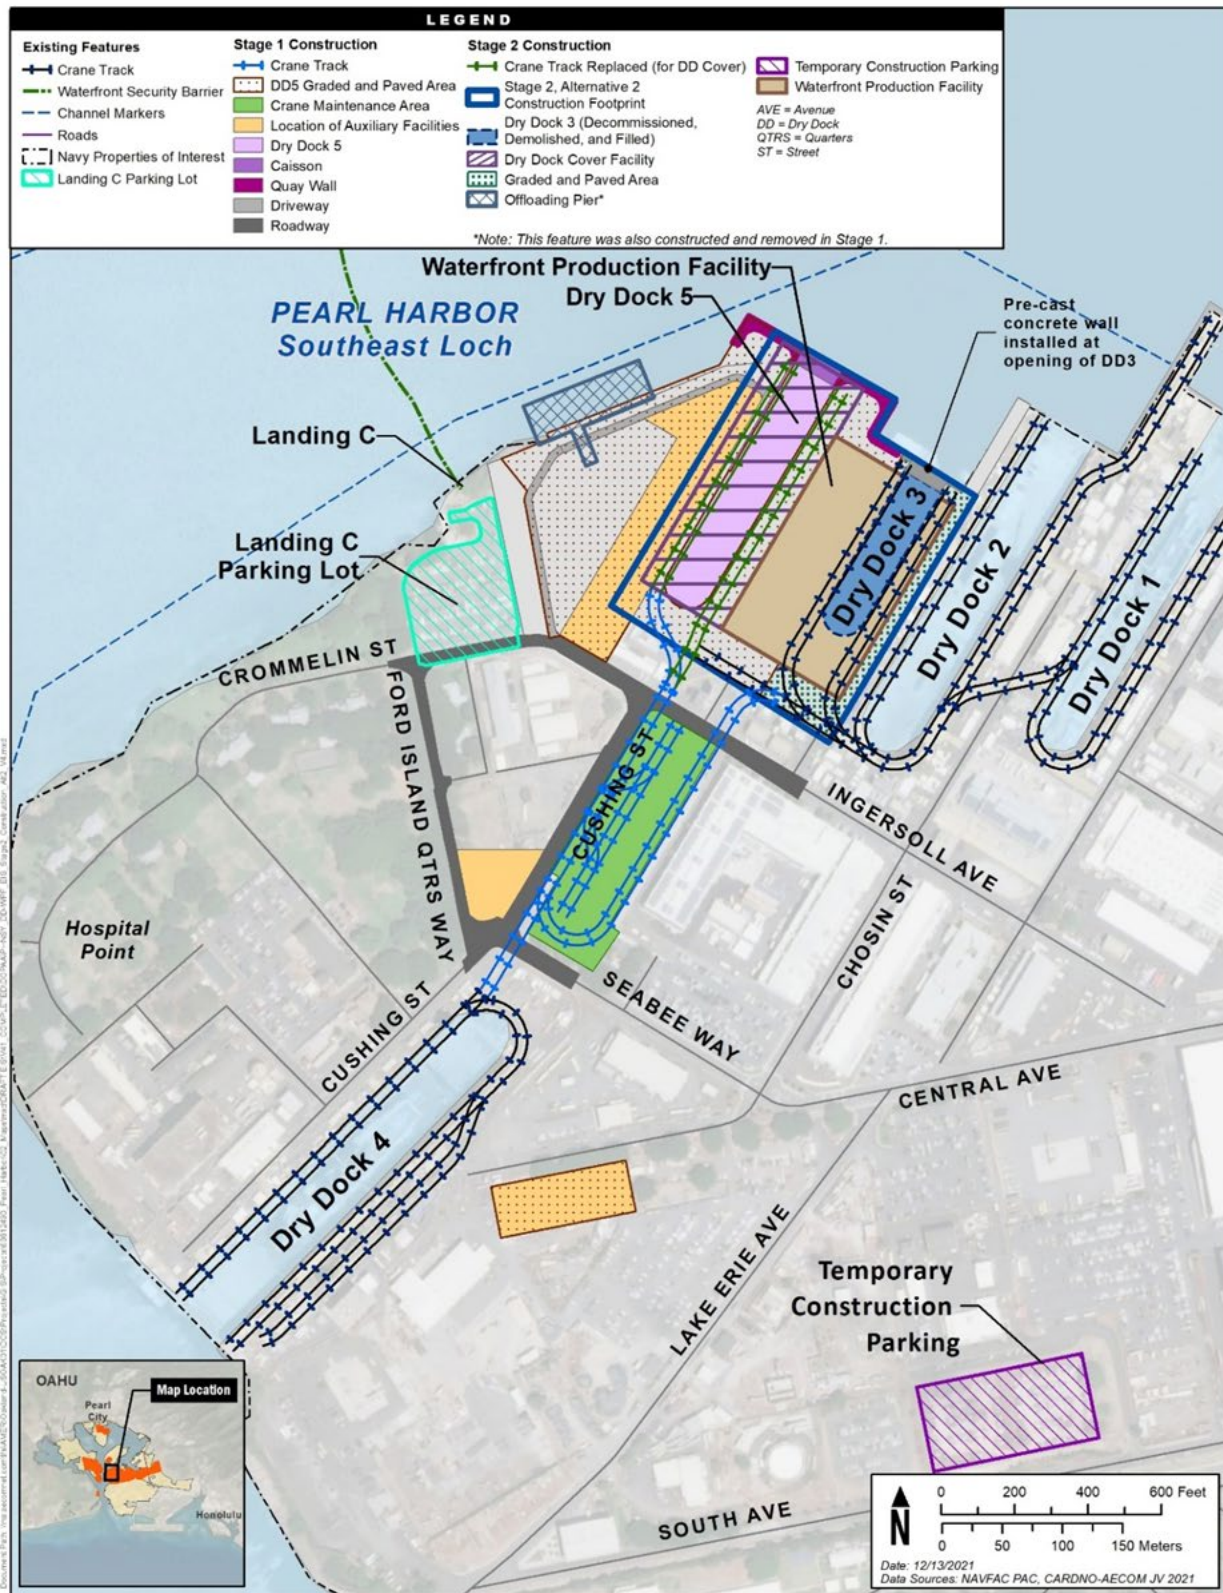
PHNSY & IMF where DD5 and WPF and some support elements will be built (Source: NAVFAC 2022a).
